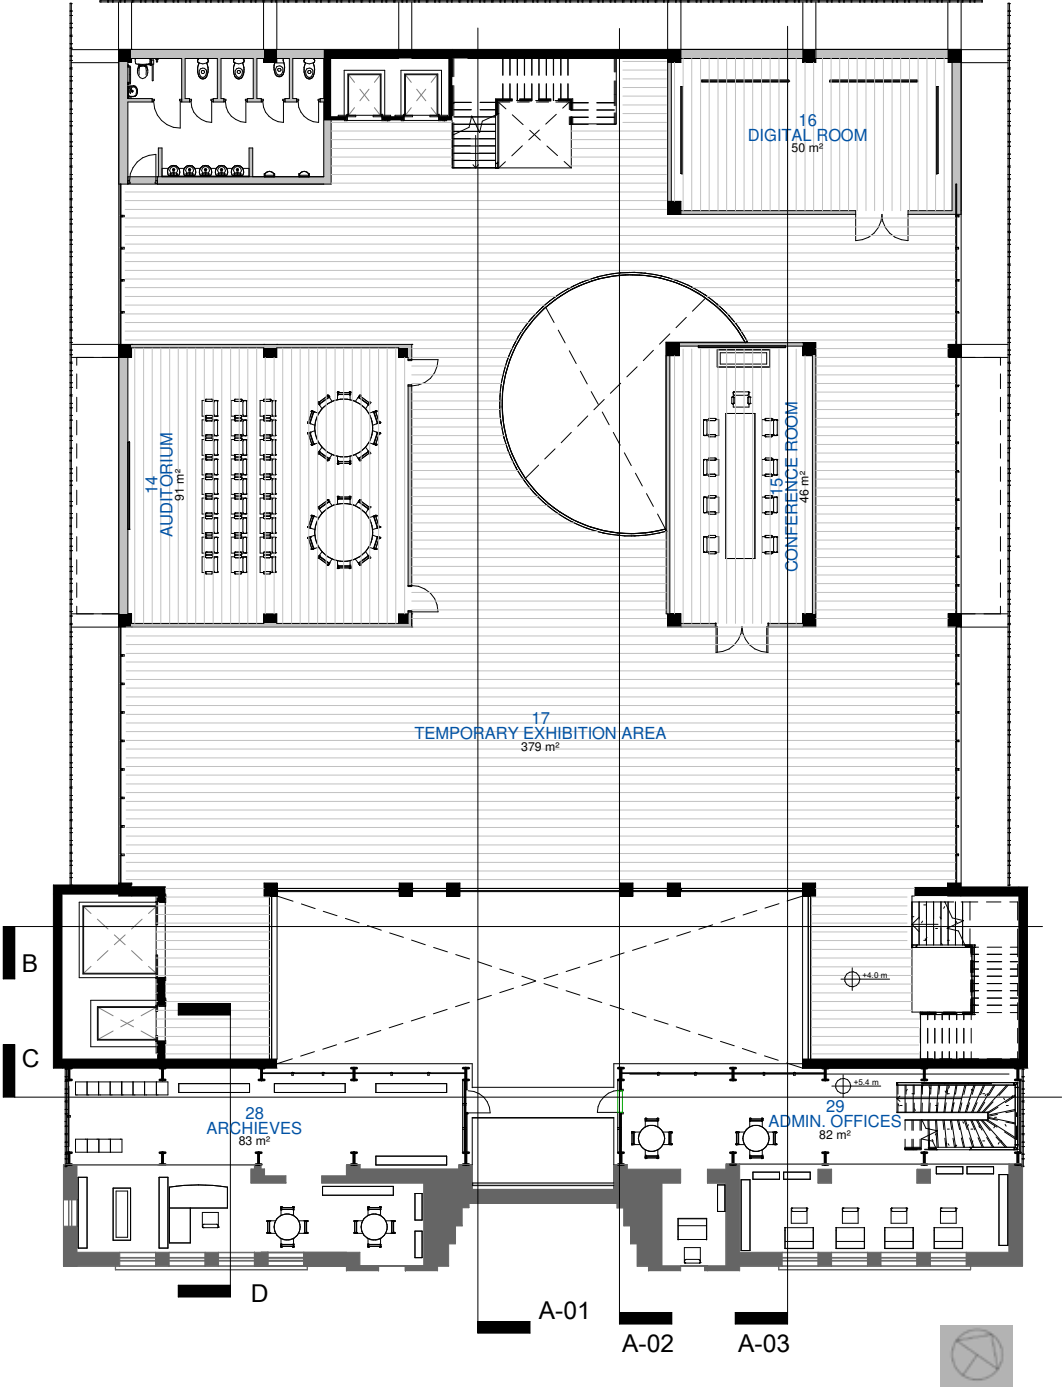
PROPOSED MUSEUM OF CINEMA - GROUND FLOOR PLAN -
